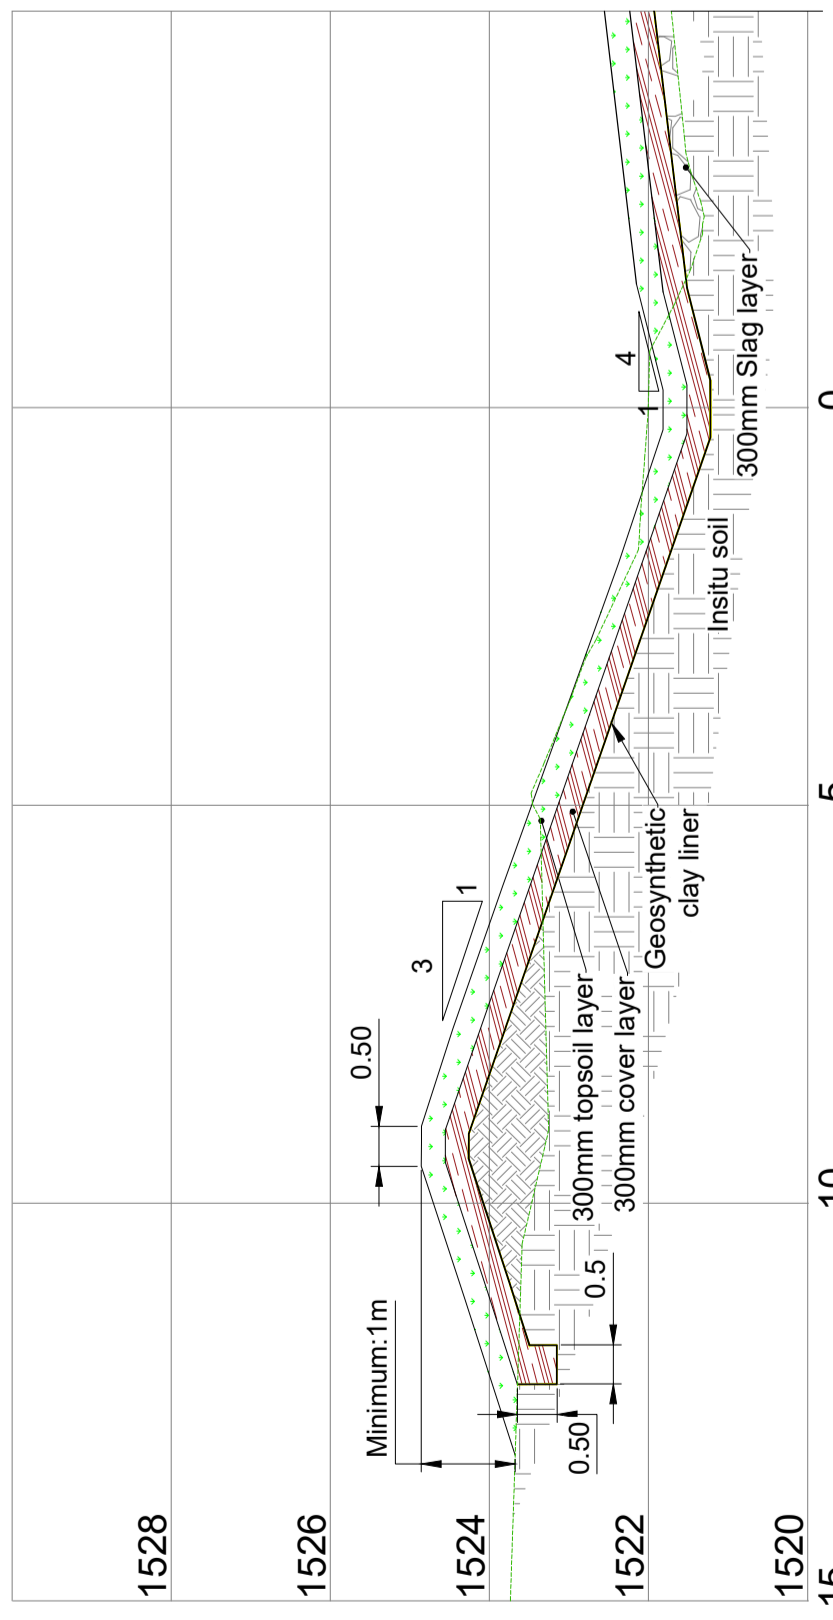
DETAIL A: INTERMEDIATE ANCHOR TRENCH
